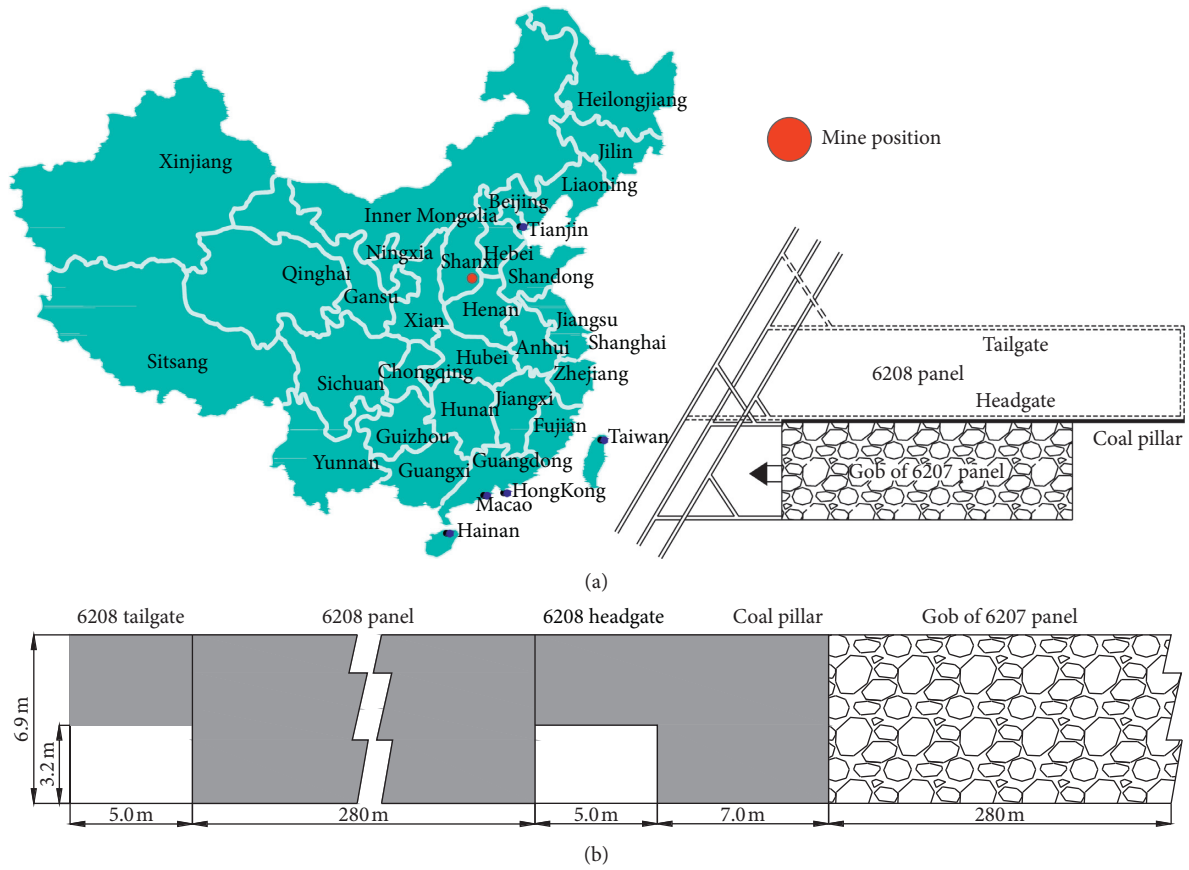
The panel introduction of sampling site: (a) mine position and plan view and (b) section view.
